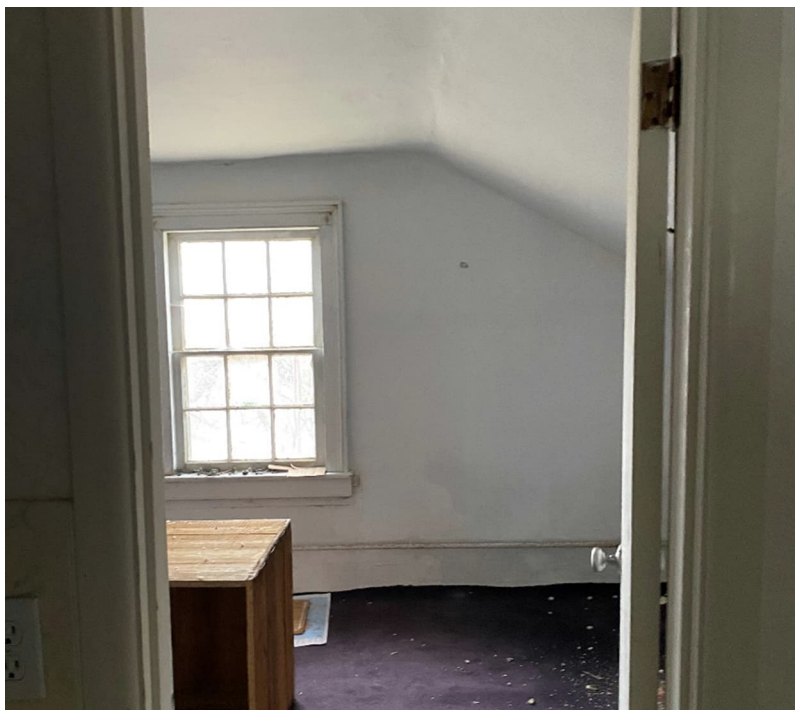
Entrance to storage room (northeast room), facing north (View M in Figure 9)
